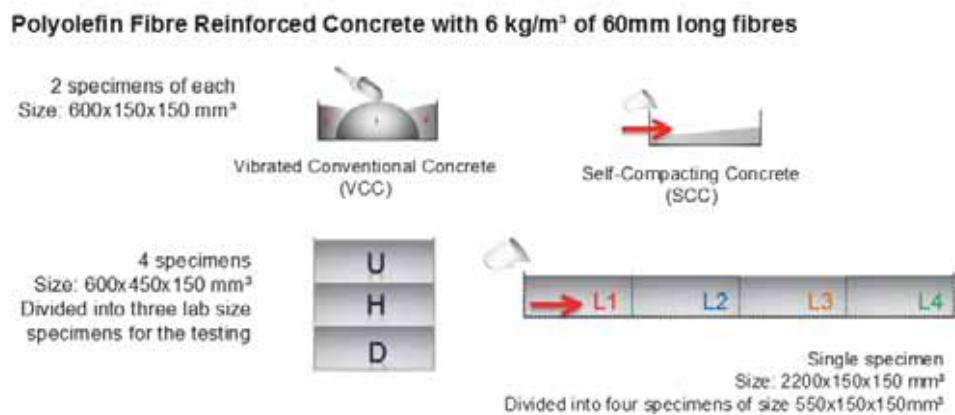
Specimens and structural elements manufactured with concrete reinforced with 6 kg/m³ of 60 mm-long polyolefin fibres in the reference [16]
